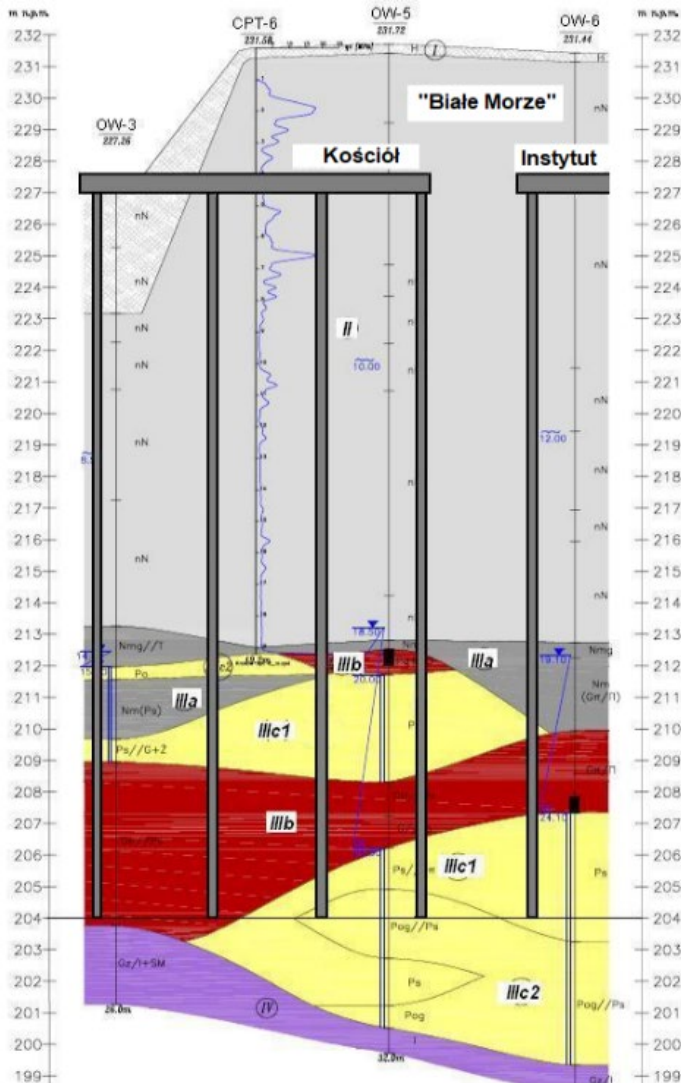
Geotechnical cross-section with foundations of John Paul II Centre facilities (The church, White Seas, The Institute). Source: the archive of Bogumił Wrana. (glossary see to side. no 3)
